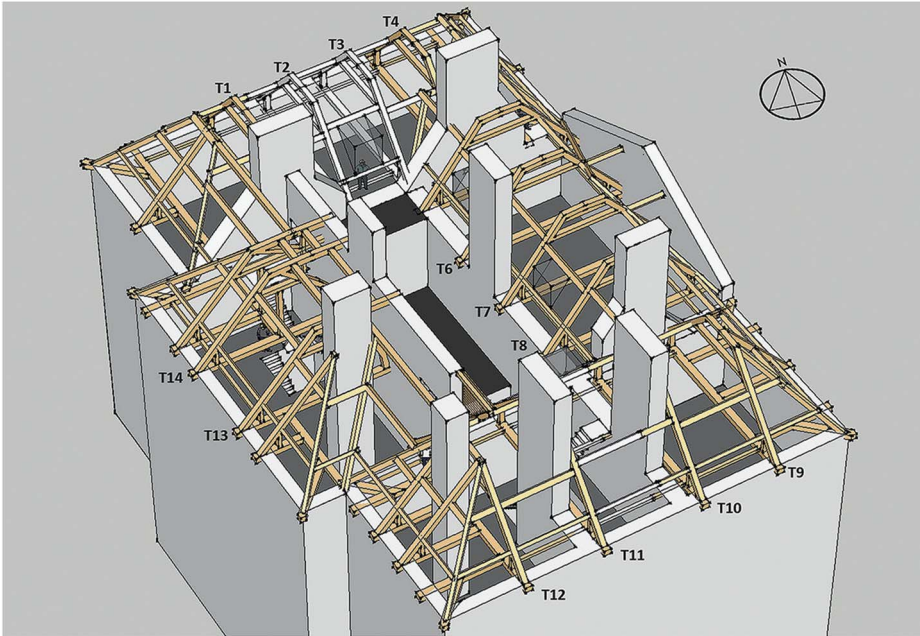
Moor Park: reconstruction of the roof: south-west view. Existing structure coloured; presumed structure in outline. *Survey:* Paul Drury. *Drawing:* David Wrightson
